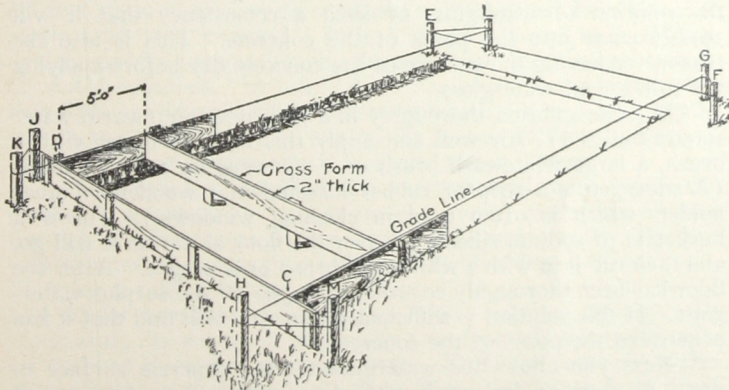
Form for Feeding Floors and Barnyard Pavements.
